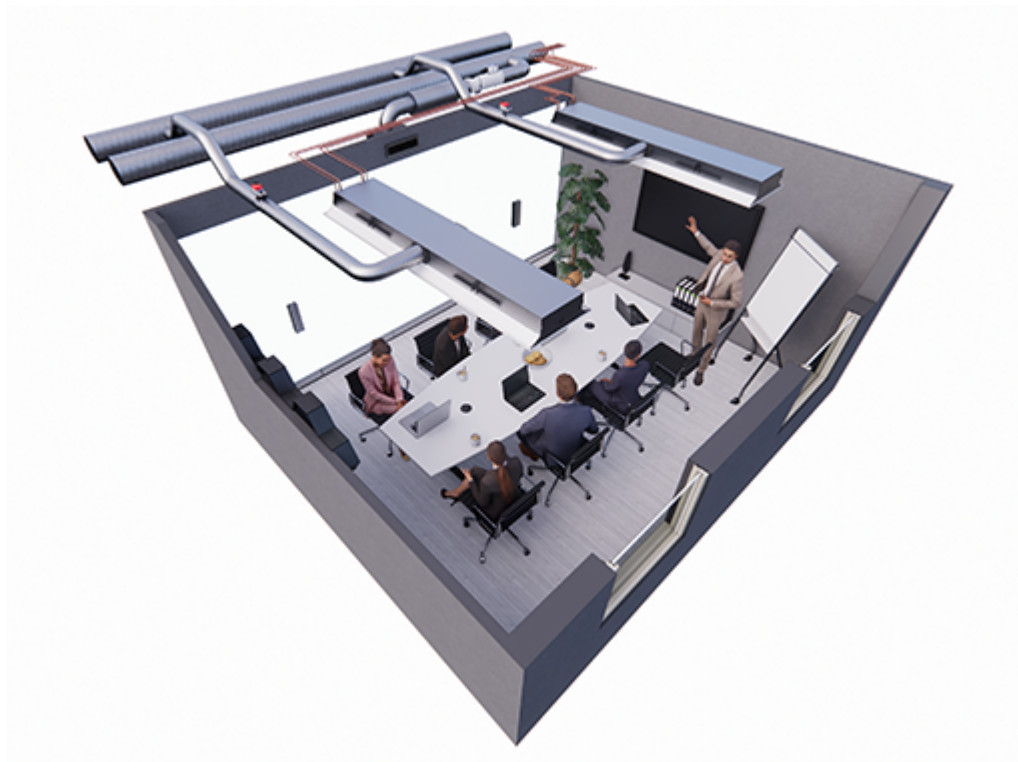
Halton Rex 600 (RE6) active chilled beams with HAQ control and PTS damper, controlled with Halton Workplace WRA room automation controllers in a meeting room
